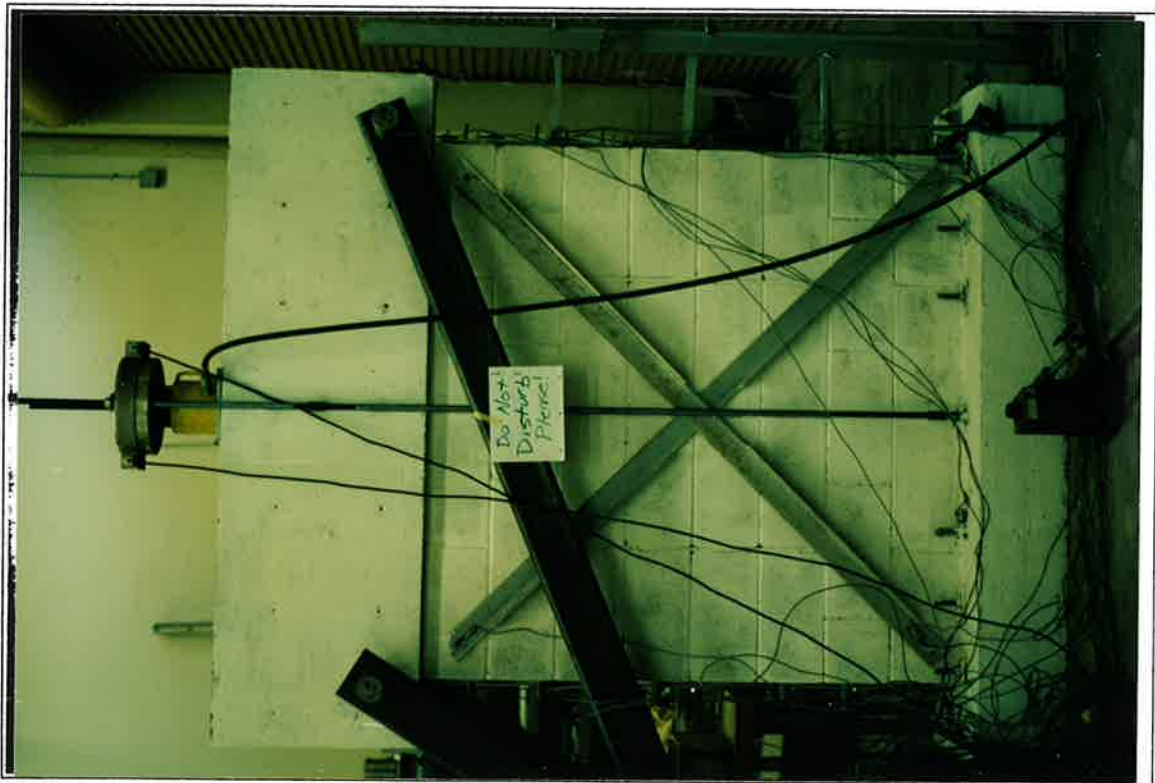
Slitted Wall At Completion of Construction Ready For Loading
